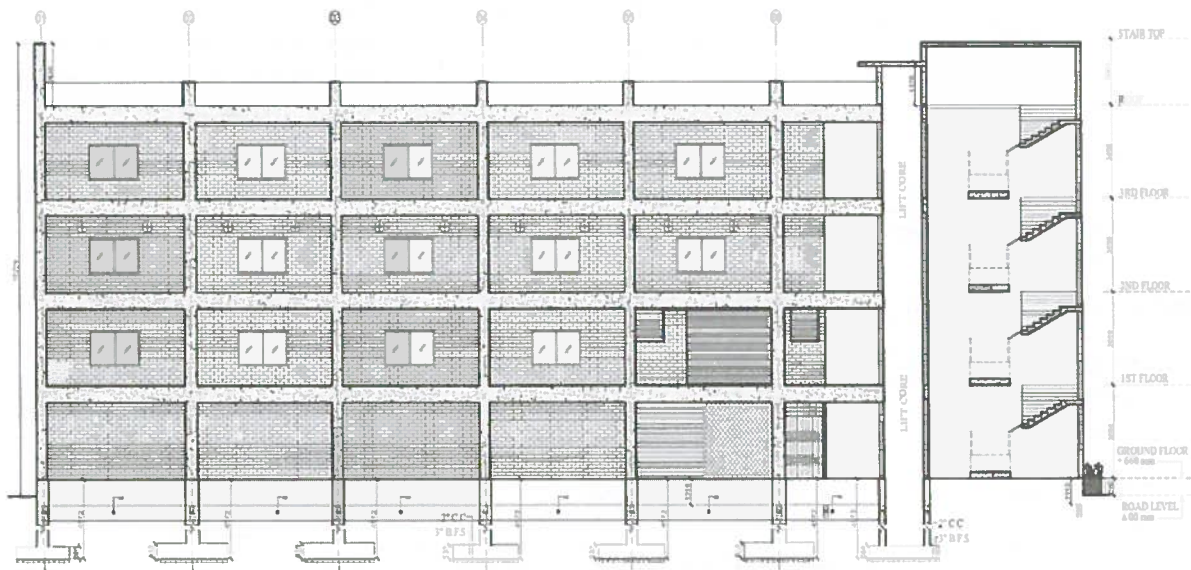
Example of Frame Elevation (Before Retrofit)
